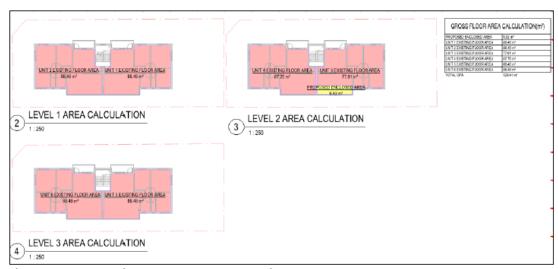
GFA Calculations Plan (Source: ASA Studio, 2024)
